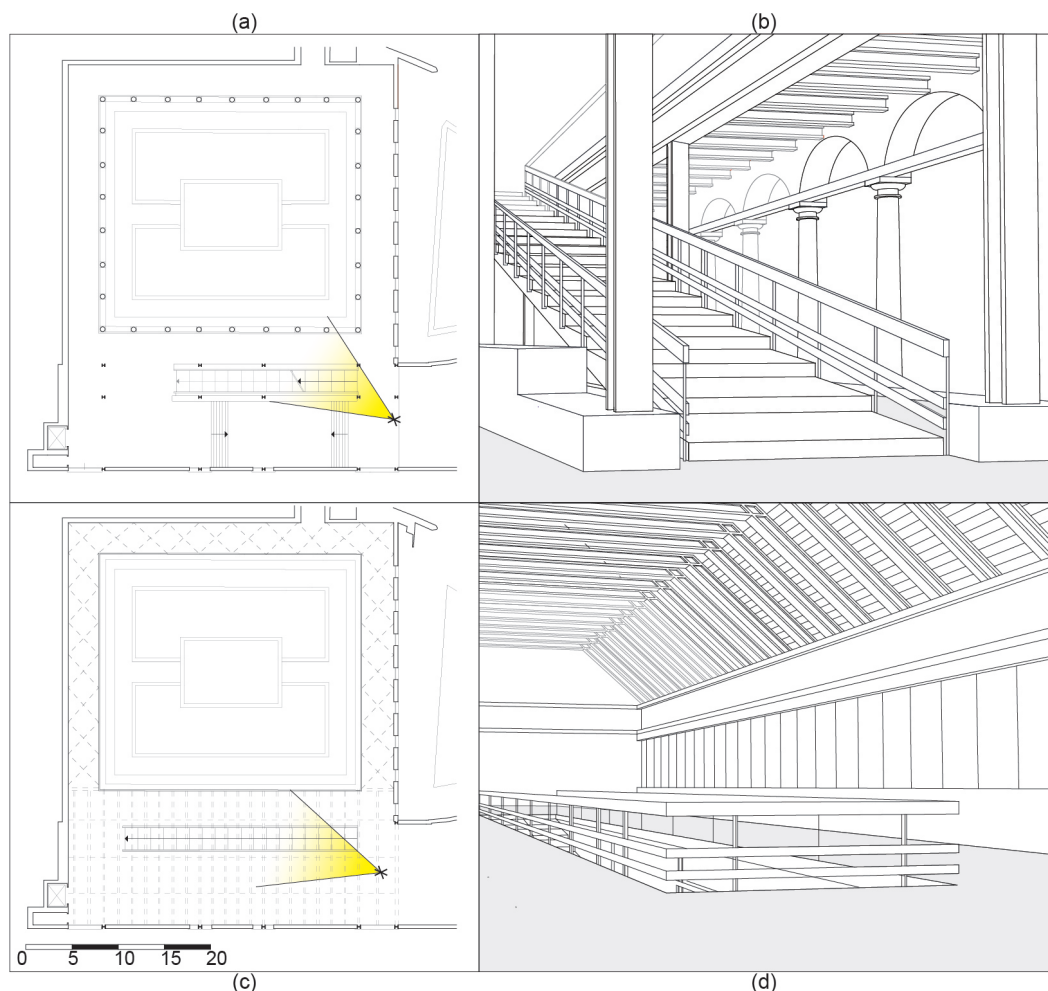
Sant'Agostino Museum, Genoa. (a) First floor plan. (b) View of the first floor where the arches delimiting the eighteenth-century cloister are highlighted. (c) Second floor plan. (d) View of the second floor highlighting the continuous series of windows.
